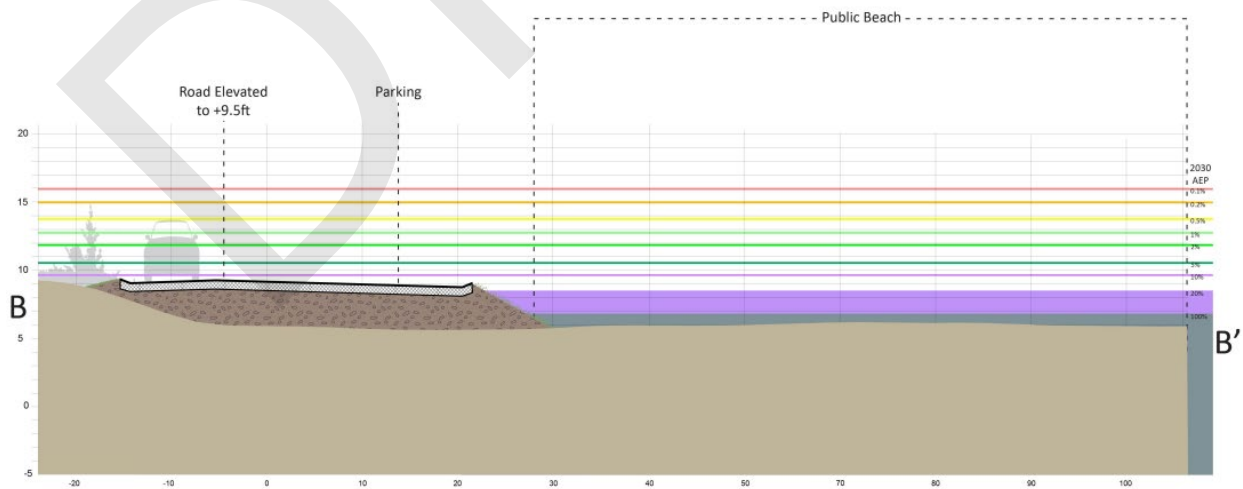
Circuit Avenue Alternative 1 – Gray, Cross-Section
